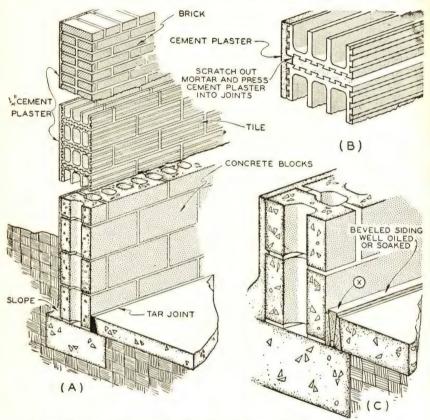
Method for Waterproofing Foundations of Concrete Blocks or Clay Tile
